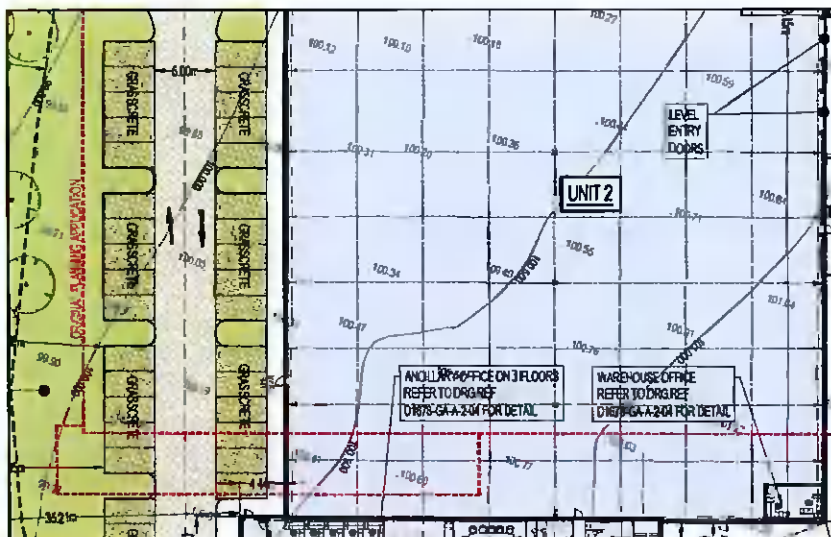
Trees/ Greened or Planted Area Every 5 No. Car Parking Spaces to the West of Unit 2
